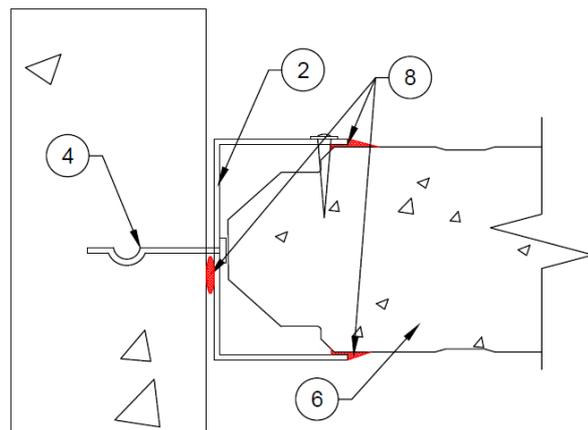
Male Panel End Detail for Vertical Speedpanel Wall
